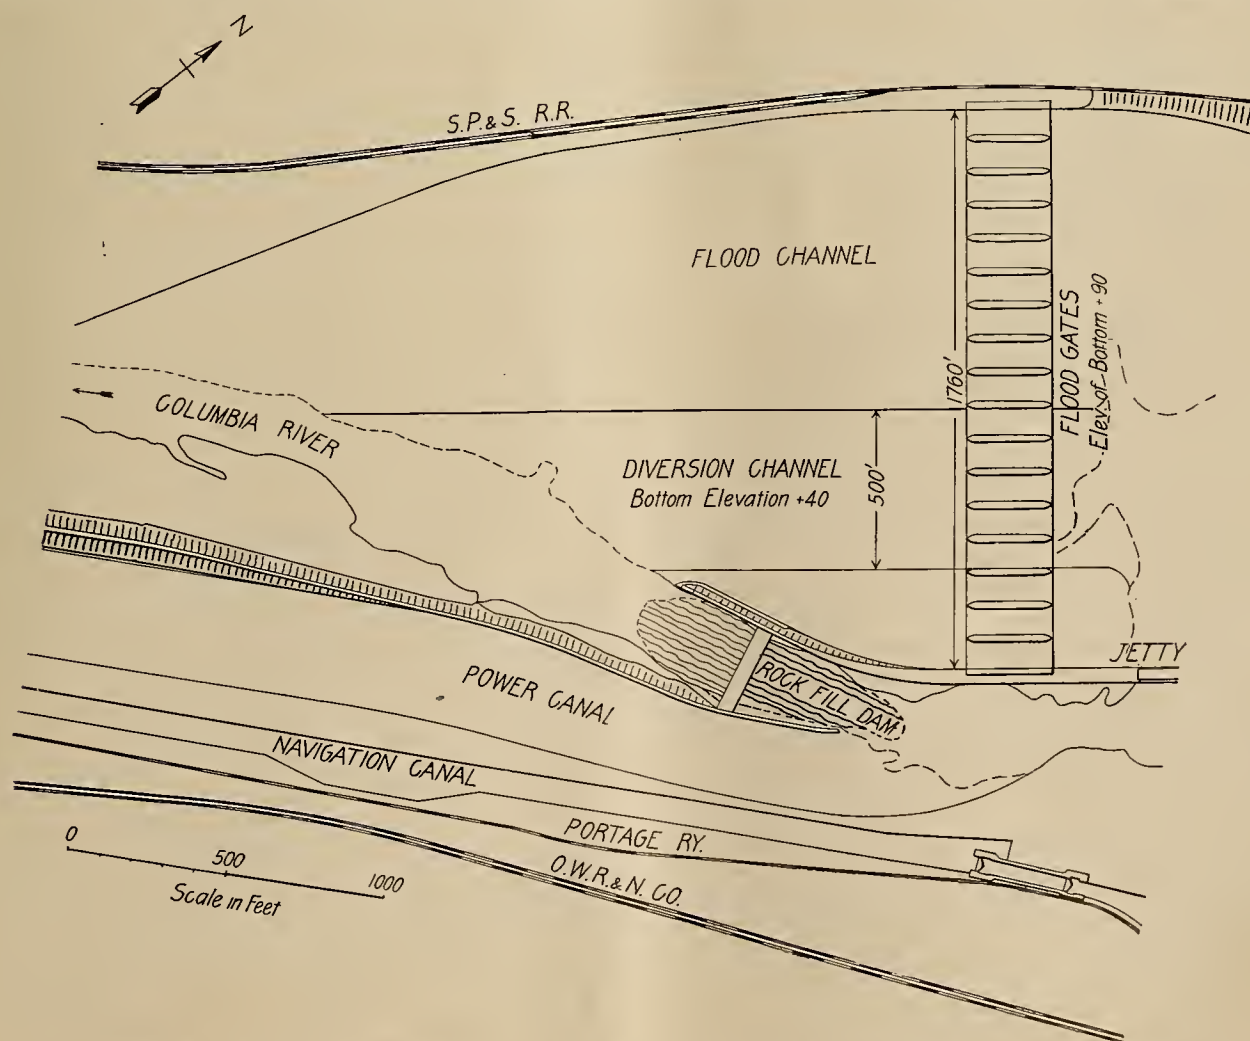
Possible Alternative Arrangement of Headworks, Transferring Canal and Power House to Oregon Shore.
